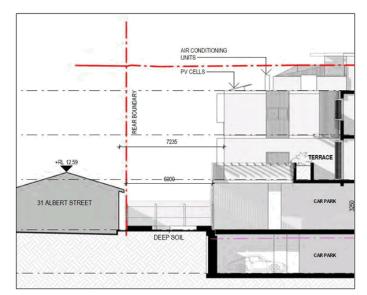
Section extract demonstrating compliant building height at the rear most plane
